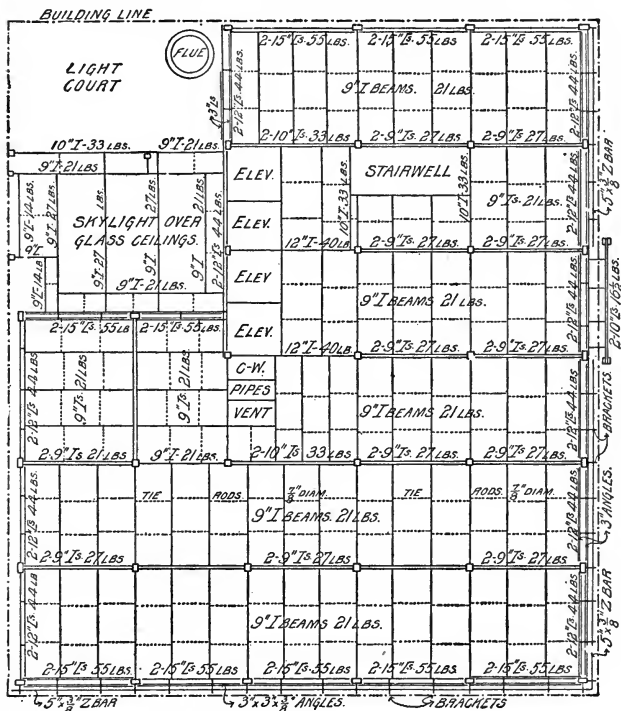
Typical Framing Plan, Fort Dearborn Building.
